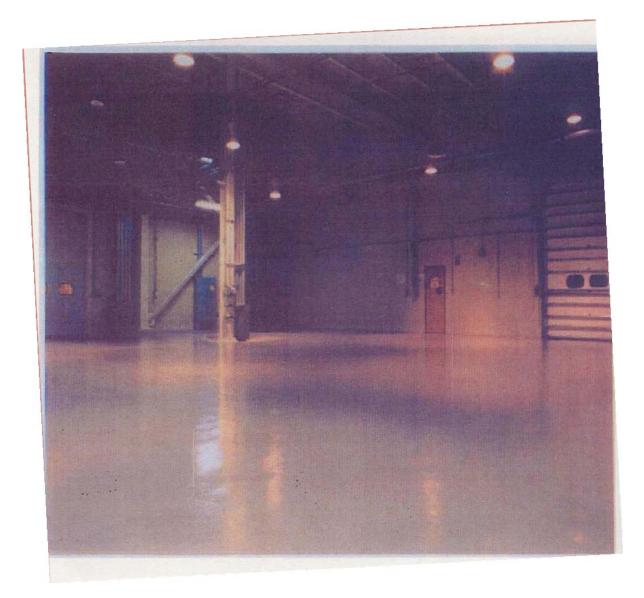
NE Corner of CH Bay of the Waste Handling Building
